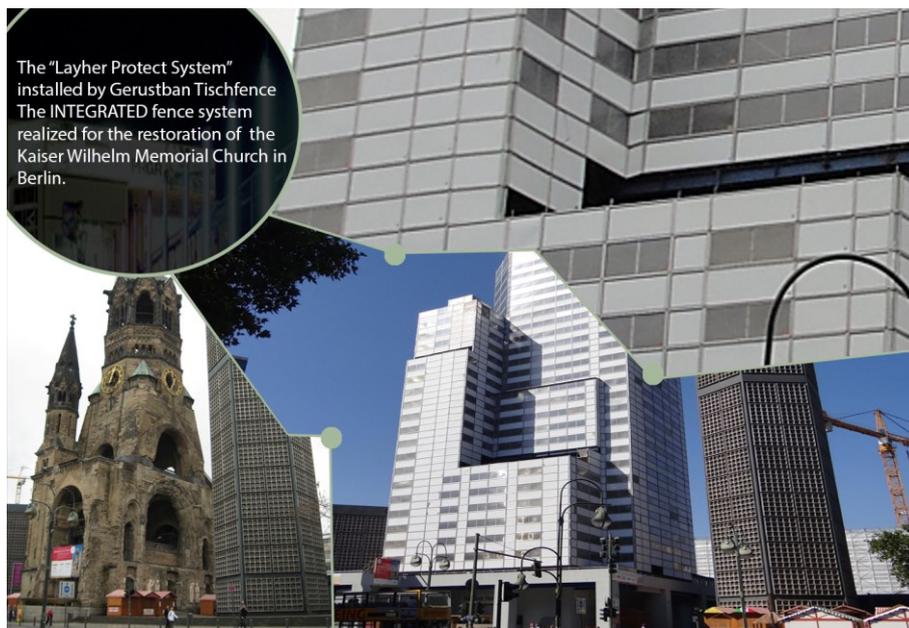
The restoration construction site of the Kaiser Wilhelm Memorial Church in Berlin
